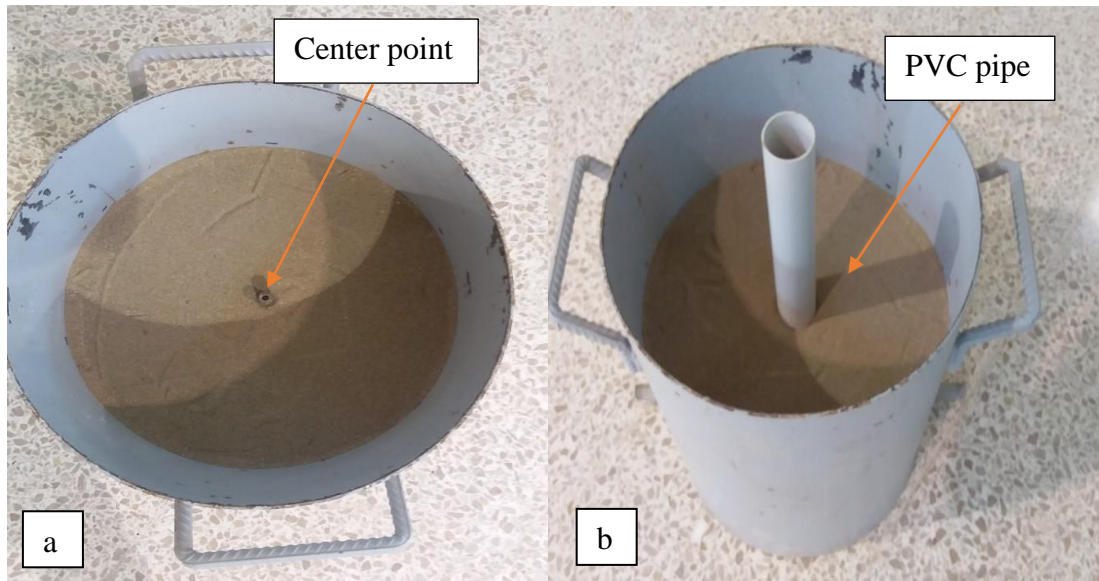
DSM column preparation in the test tank: (a) locating the center of test tank (b) placing the PVC pipe for forming DSM column
